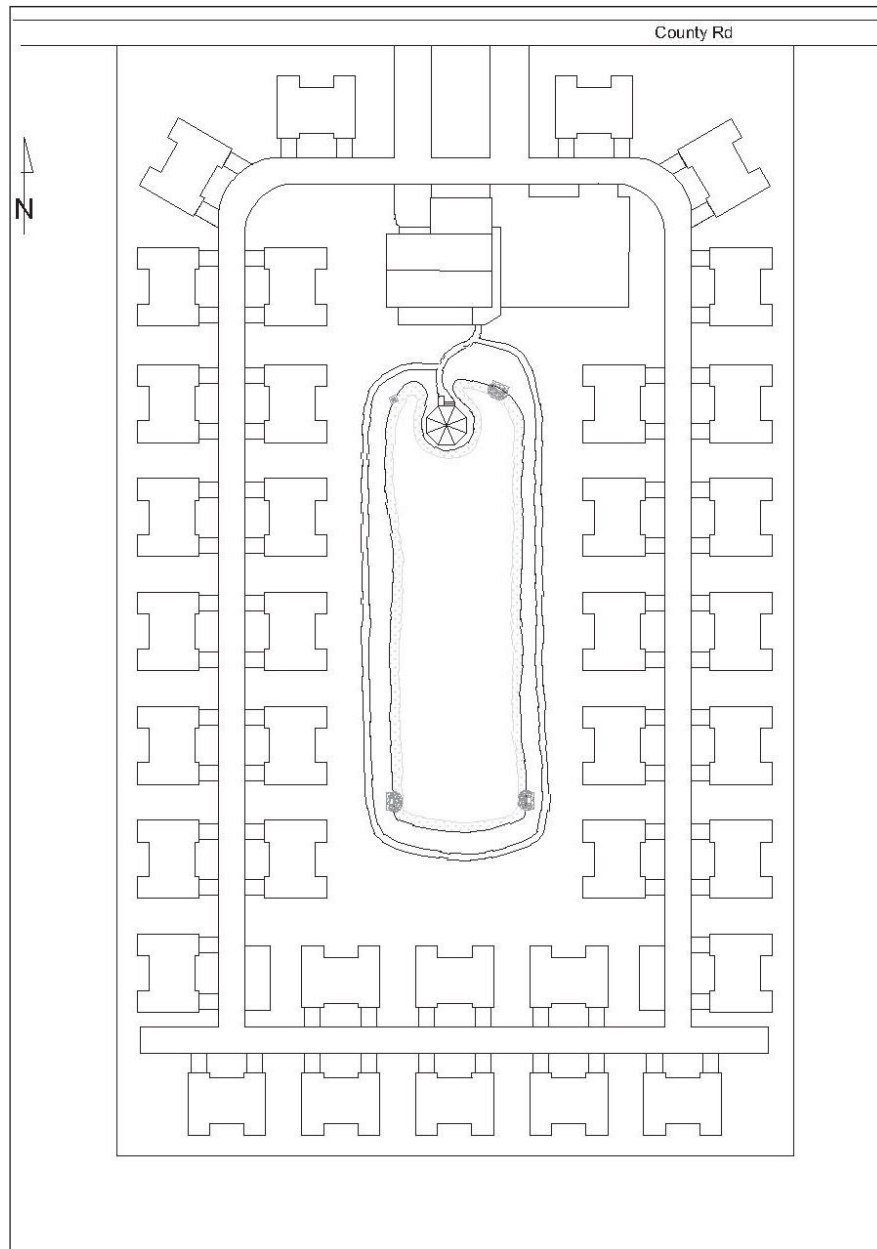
B.1. Autumn Knoll Subdivision Site Plan.
